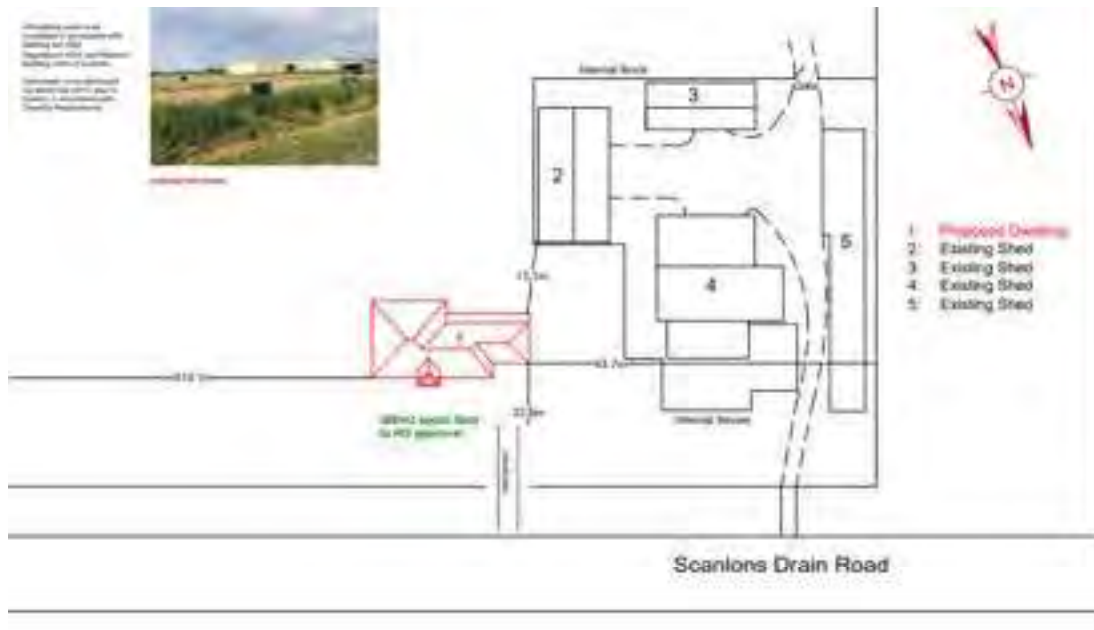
Existing shed plan and proposed dwelling. Source: SJD Homes
